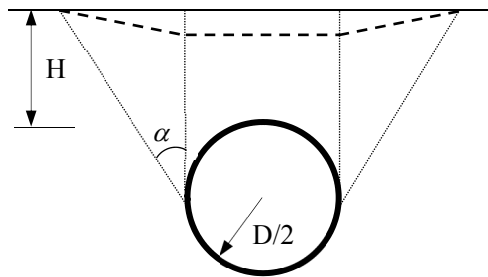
Ground surface settlement profile in case of shallow tunnel.
